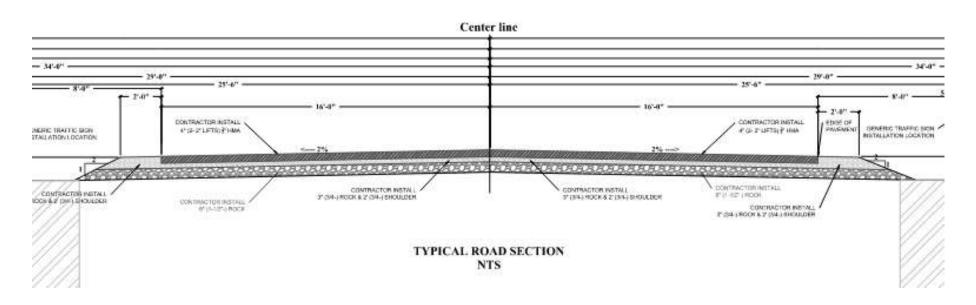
Typical Road Section for Boardman Airport Lane (Paved Width); Source: Port of Morrow Airport Road Infrastructure Plans
